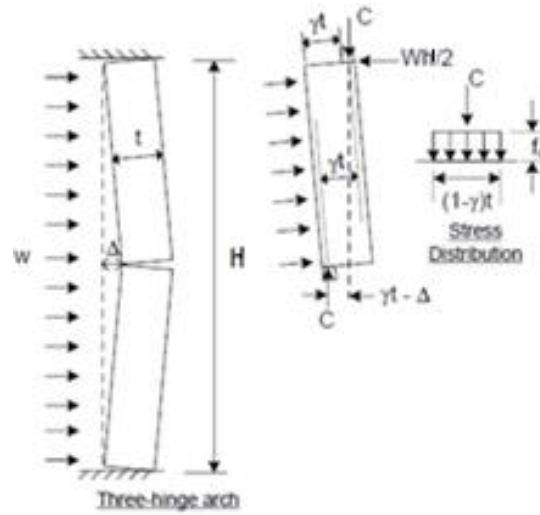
Force Diagram of URM Wall (Saatcioglu et al., 2018)
